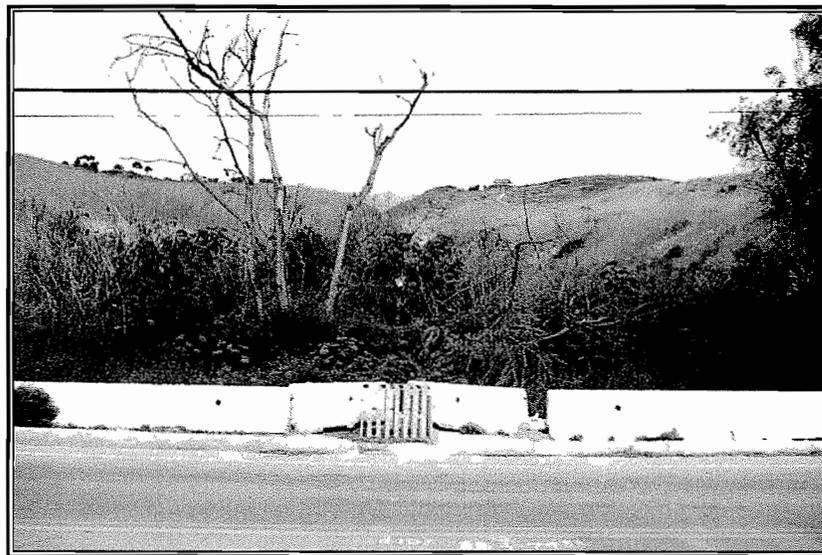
View north up San Ramon Canyon from W. 25th Street.
